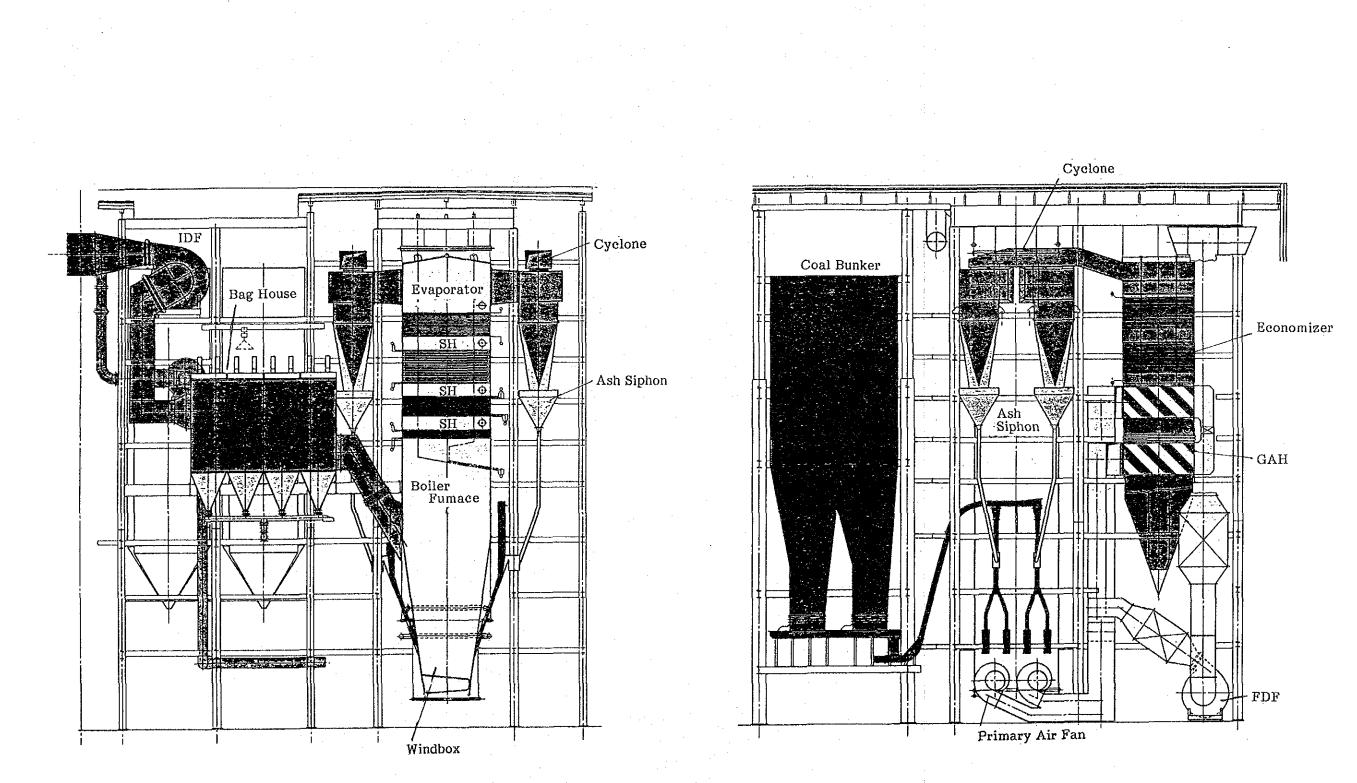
Example of Sectional View of Fluidized Bed Boiler
